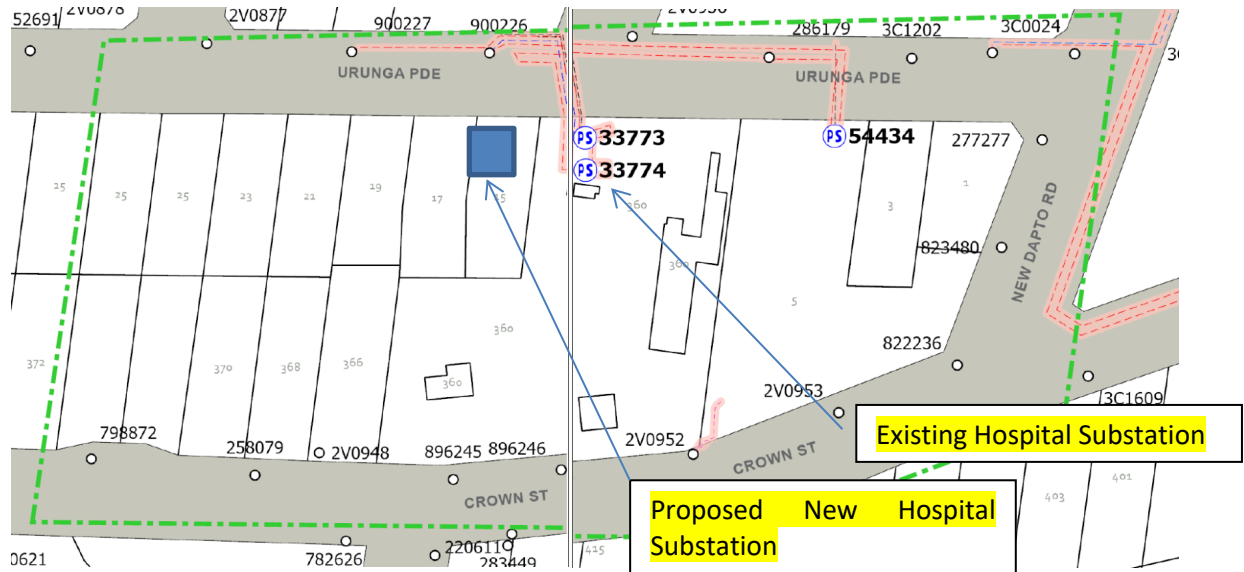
Existing Underground Endeavour Energy Network and Indicative New Substation Location
